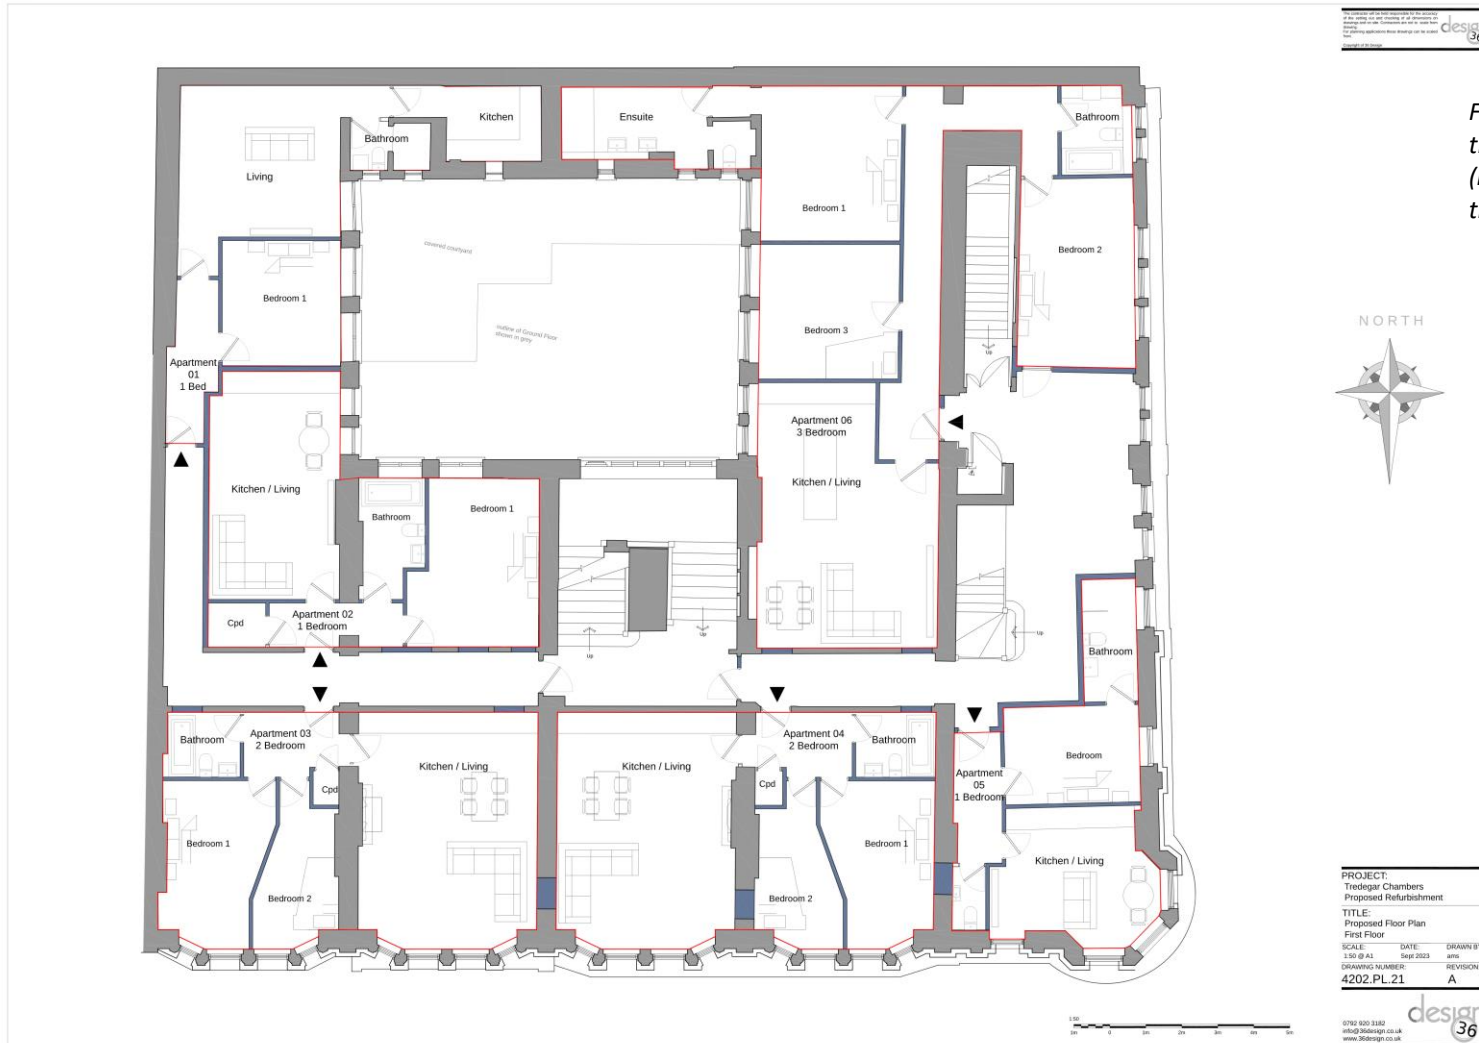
Proposed Plan of the First Floor (reproduced courtesy of the client).
